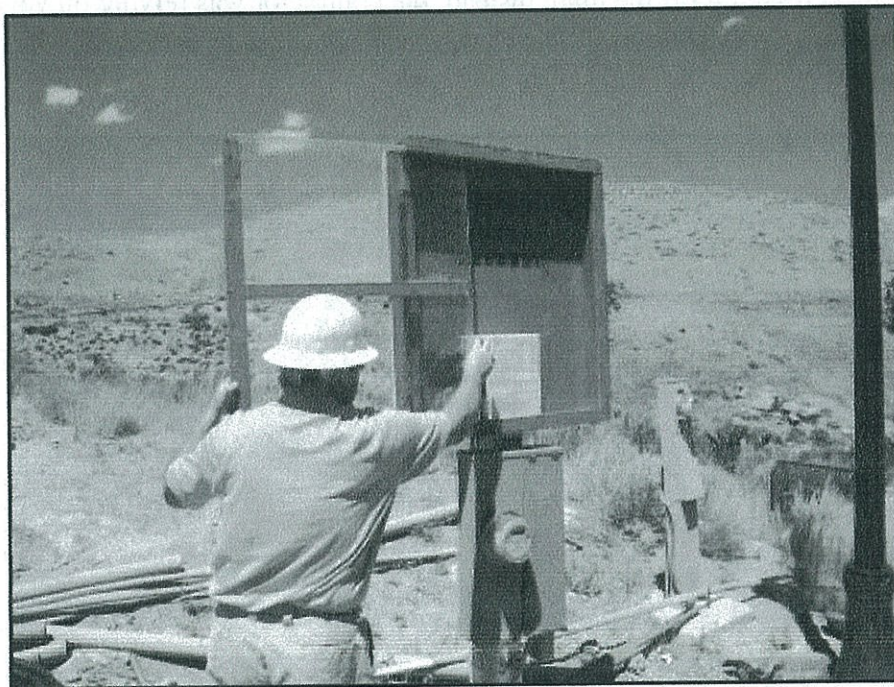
Contractor removing the SWPPP from its storage location at the Bella Rio Construction site.
